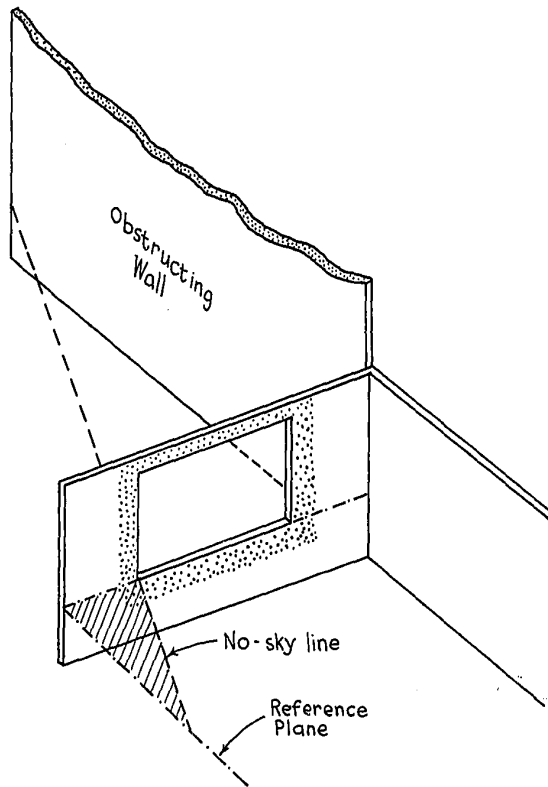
No-sky line for an obstructing wall perpendicular to the window wall.
